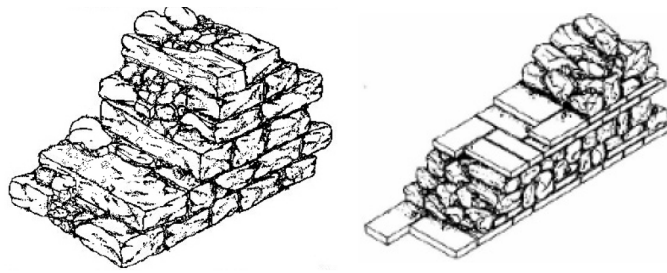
Examples of mixed brick and stone constructions (Ferrini et al. 2003).
